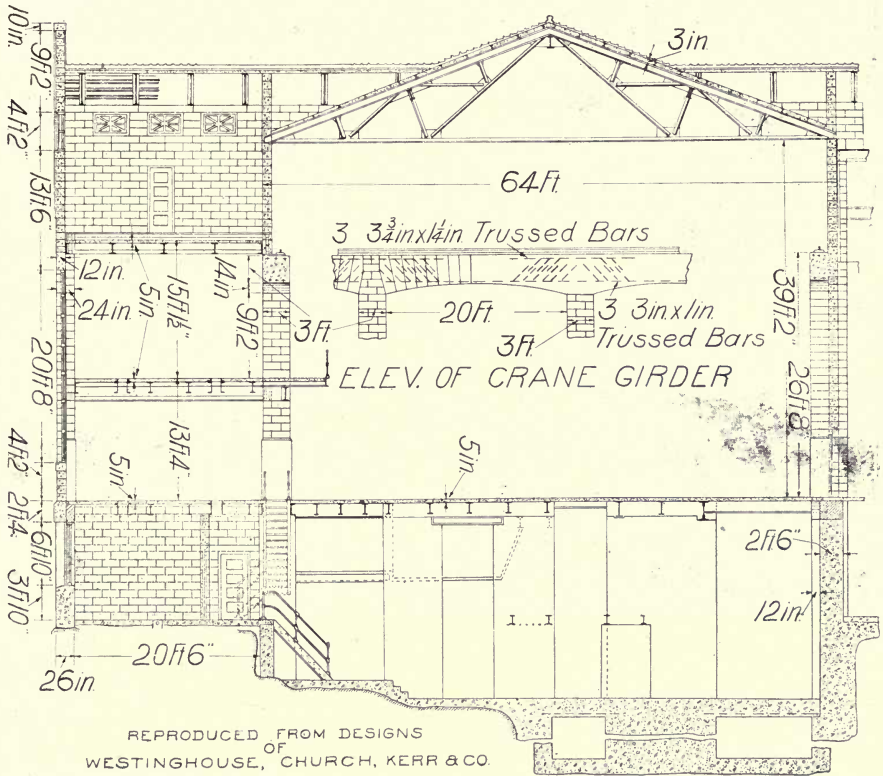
CROSS SECTION THROUGH TURBINE ROOM, COS COB POWER PLANT.
